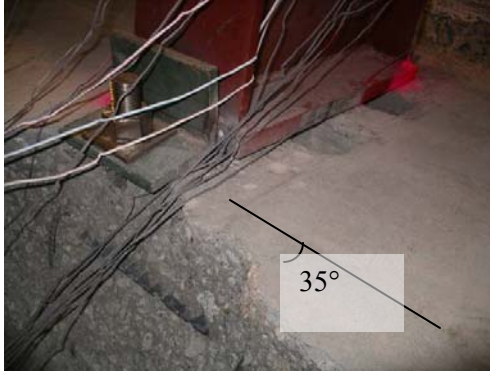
Concrete breakout at 35° on reinforced concrete pier due to insufficient concrete edge distance of the bolts
